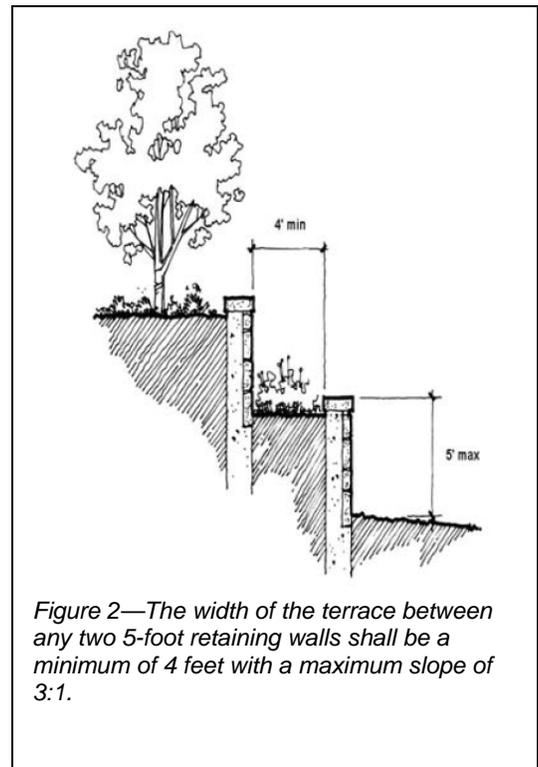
The width of the terrace between any two 5-foot retaining walls shall be a minimum of 4 feet with a maximum slope of 3:1.
